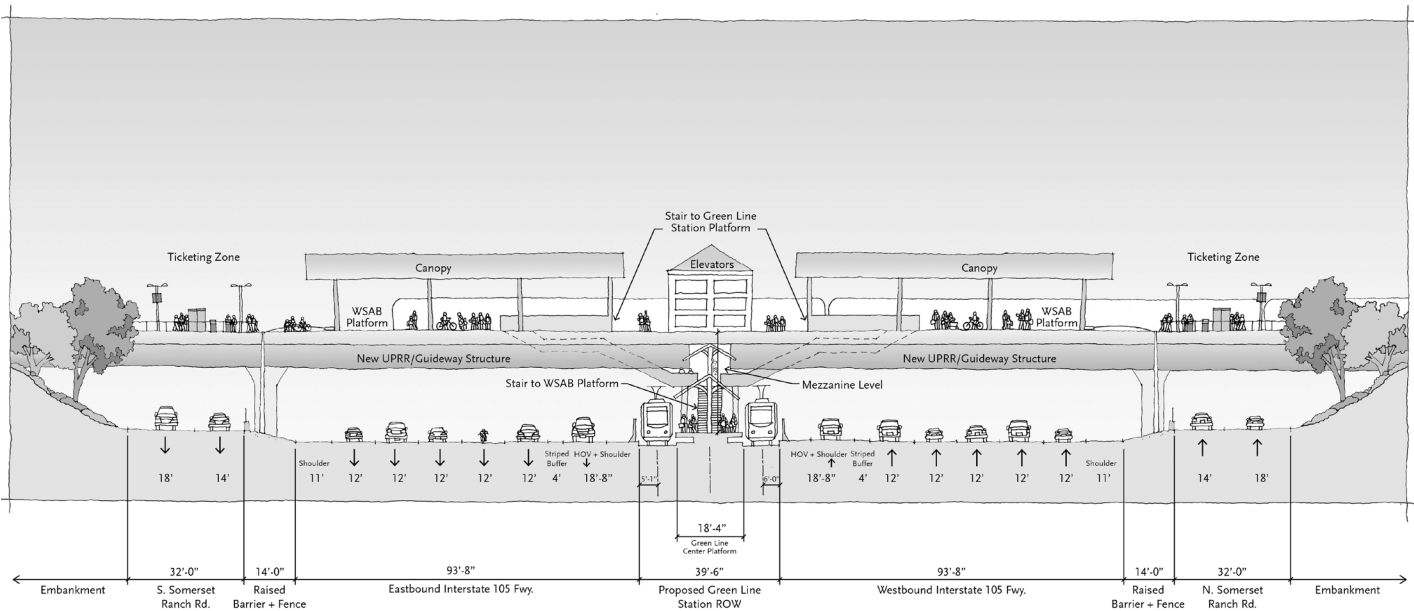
Conceptual cross-section drawing (looking west) for a New Metro Green Line Station below a new WSAB Station at Florine Ave. and Century Blvd. in the City of Paramount
